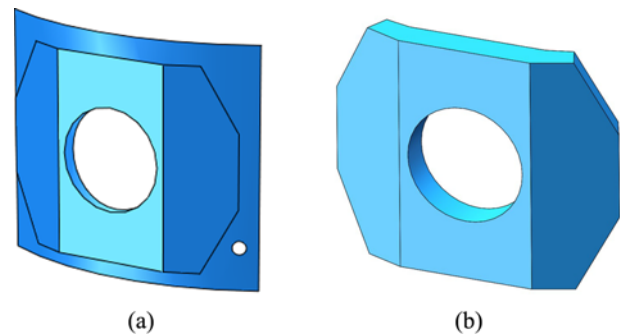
Details around Penetration: (a) Local Reinforcement, (b) Local Thicken Area
